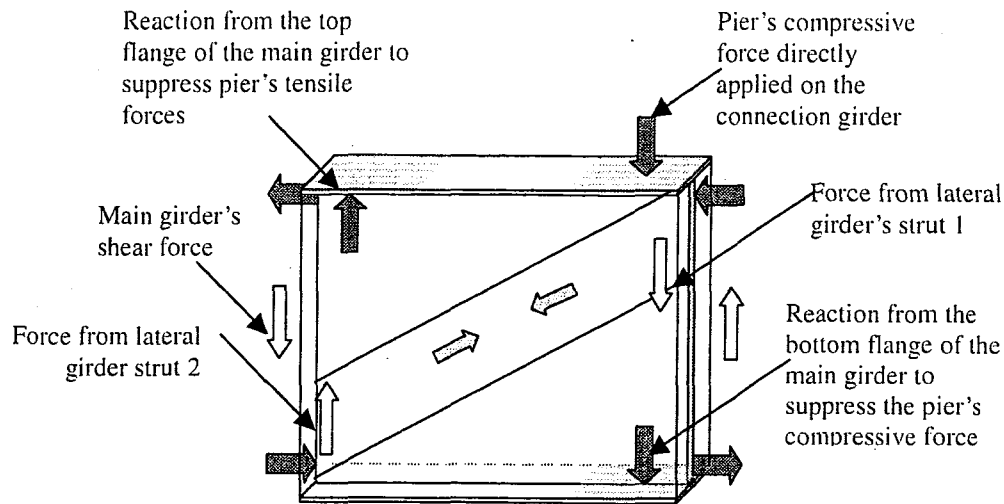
Force transfer mechanism in portion of main girder inside connection (C-2)
